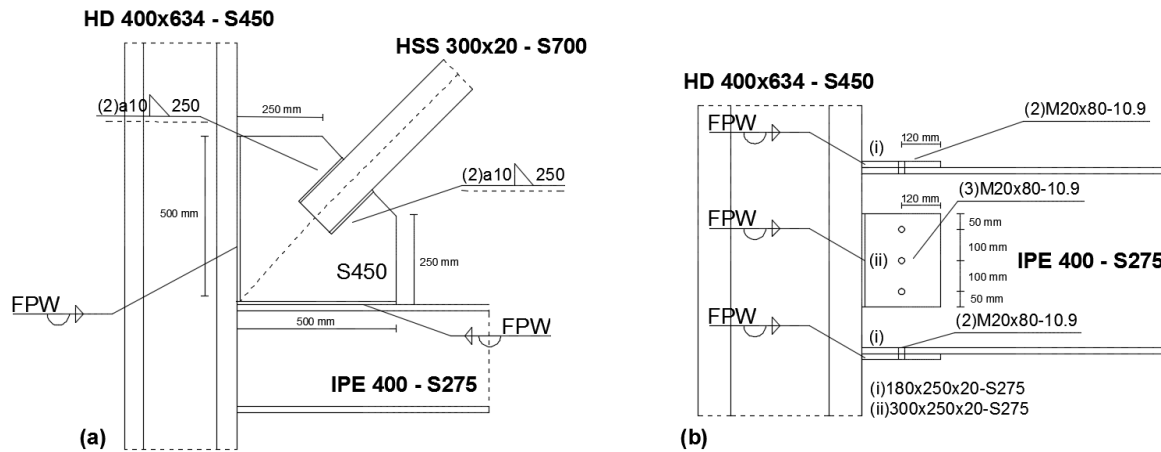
Details of (a) gusset-plate and (b) beam-to-column connections. Note: HR-01 – first floor.
